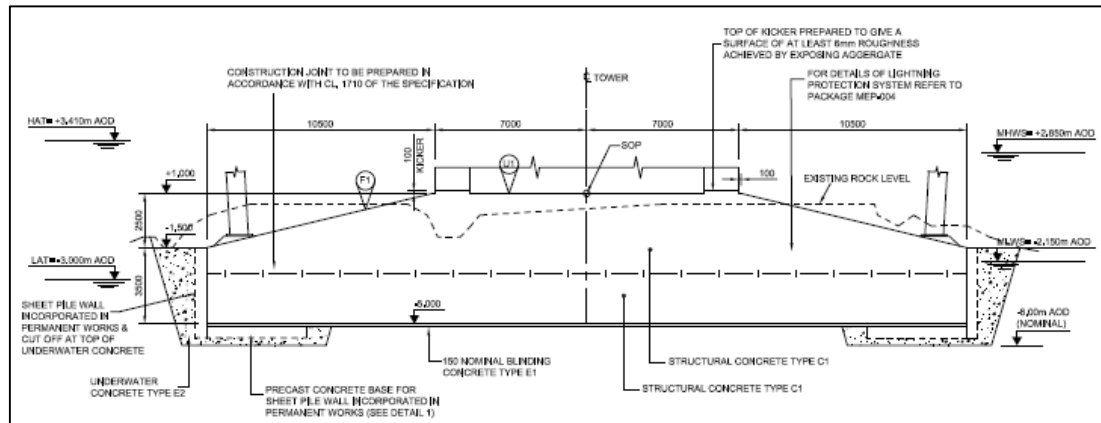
Central Tower foundation drawing (Ramboll i, 2015)
